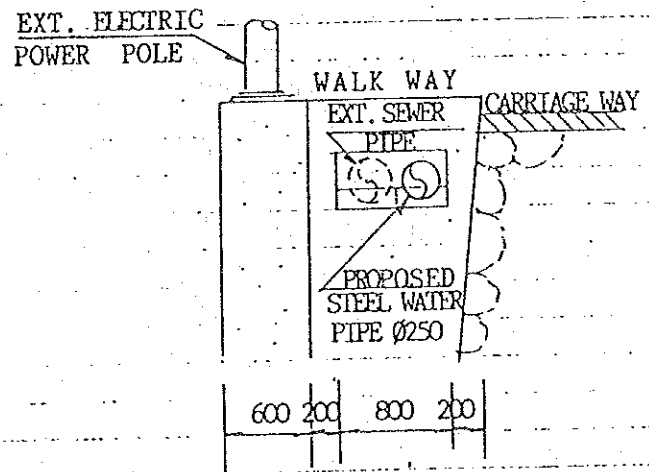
WATER PIPE LINE ALONG CAUSEWAY TO ARAKABESAN I.S.
